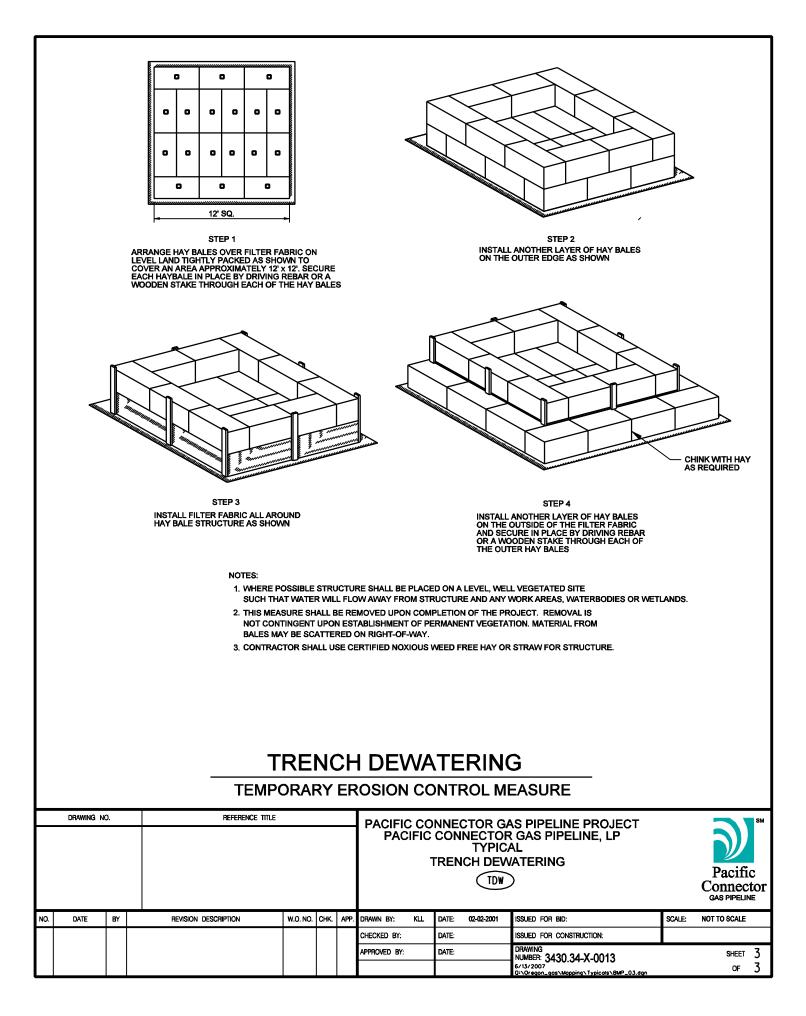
X-0012 (Sheets 1-3) and Drawing 3430.34-X-0013 (Sheets 1 of 3 and 3 of 3)
